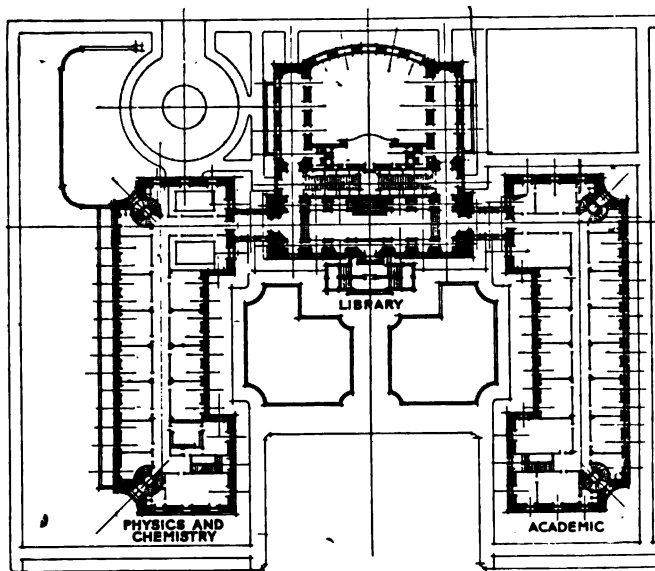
GROUND PLAN, ACADEMIC GROUP.
